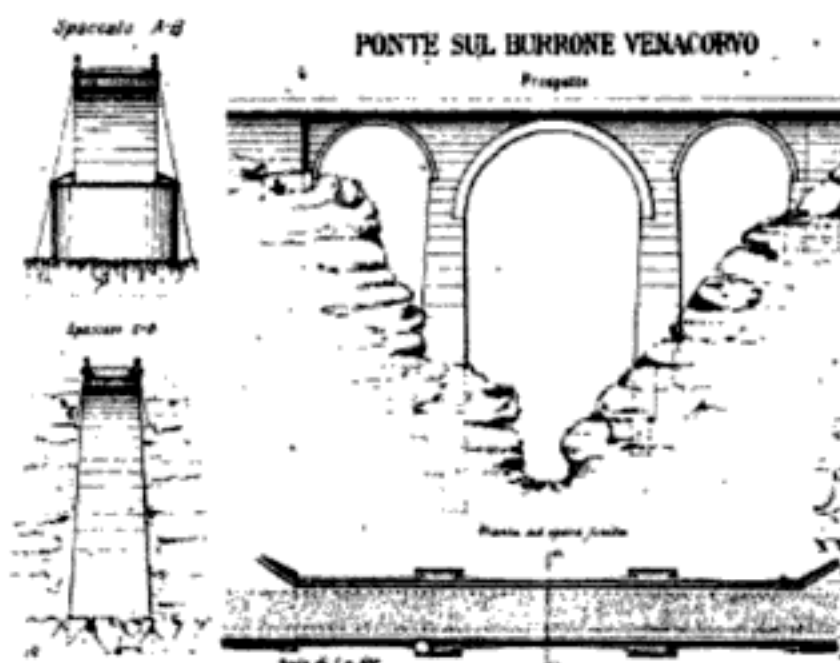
Plan, front and sections of the bridge built on Venacorvo ravine.
